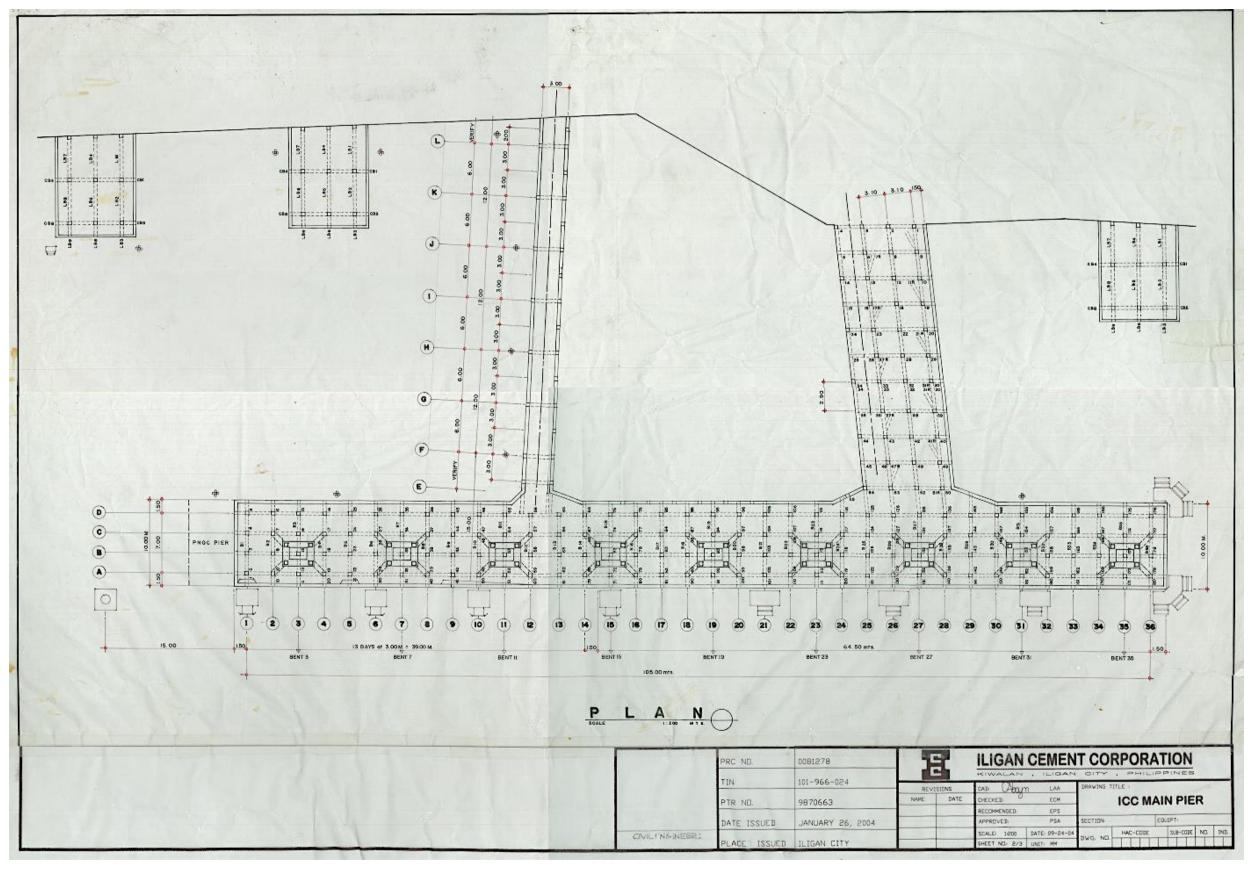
Layout of Beach Pad/Wharf and Pier Facility (NO CHANGE PROPOSED)
